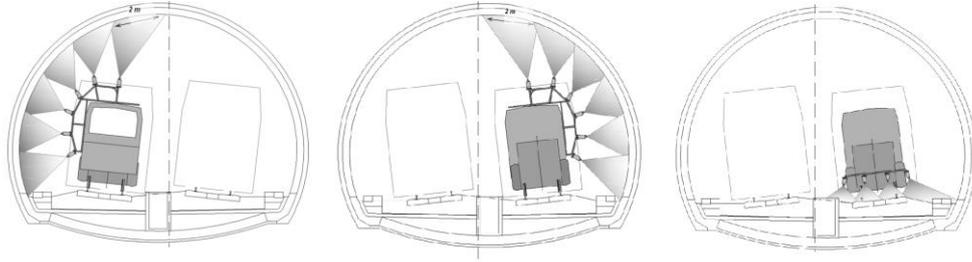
Diagram of the cameras' installation for wall and railway inspection
